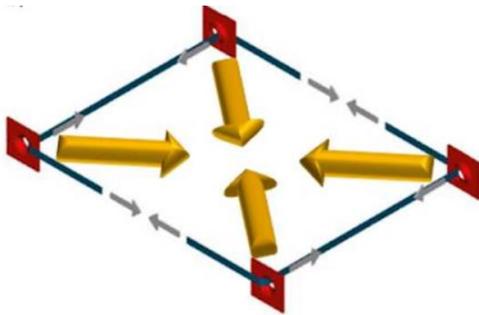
The CAM system: how a pre-tensioned steel ribbon compresses the masonry (SOURCE: Ferretti E, Pascale G. Combined Strengthening Techniques to Improve the Out-of-Plane Performance of Masonry Walls. Materials (Basel).
